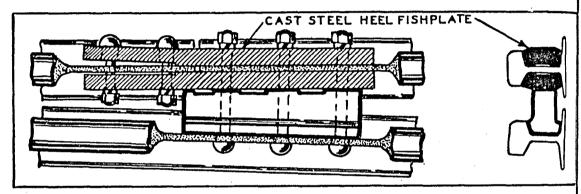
TYPICAL 80& 100B. Y LAYOUT HEEL
